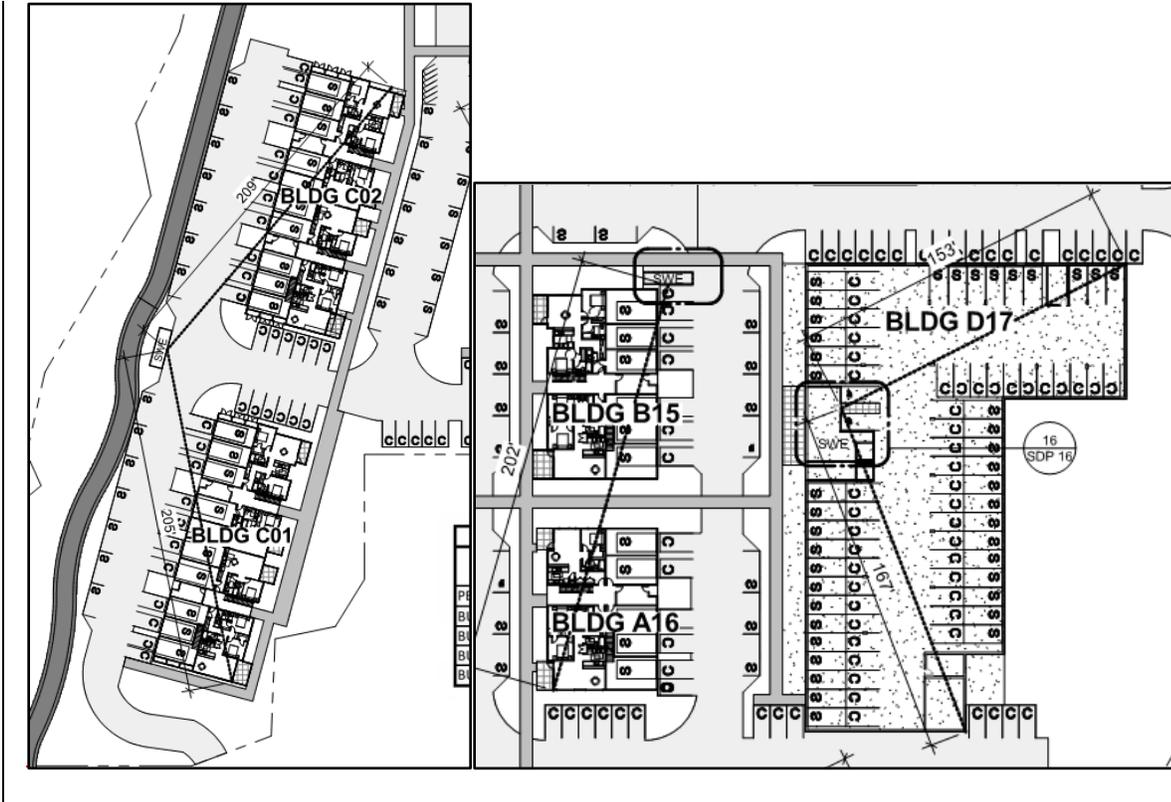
A, left, shows the location of the trash enclosure for buildings 1 and 2. Figure 30B, shows the location of the trash enclosures for buildings 15, 16 and 17.
